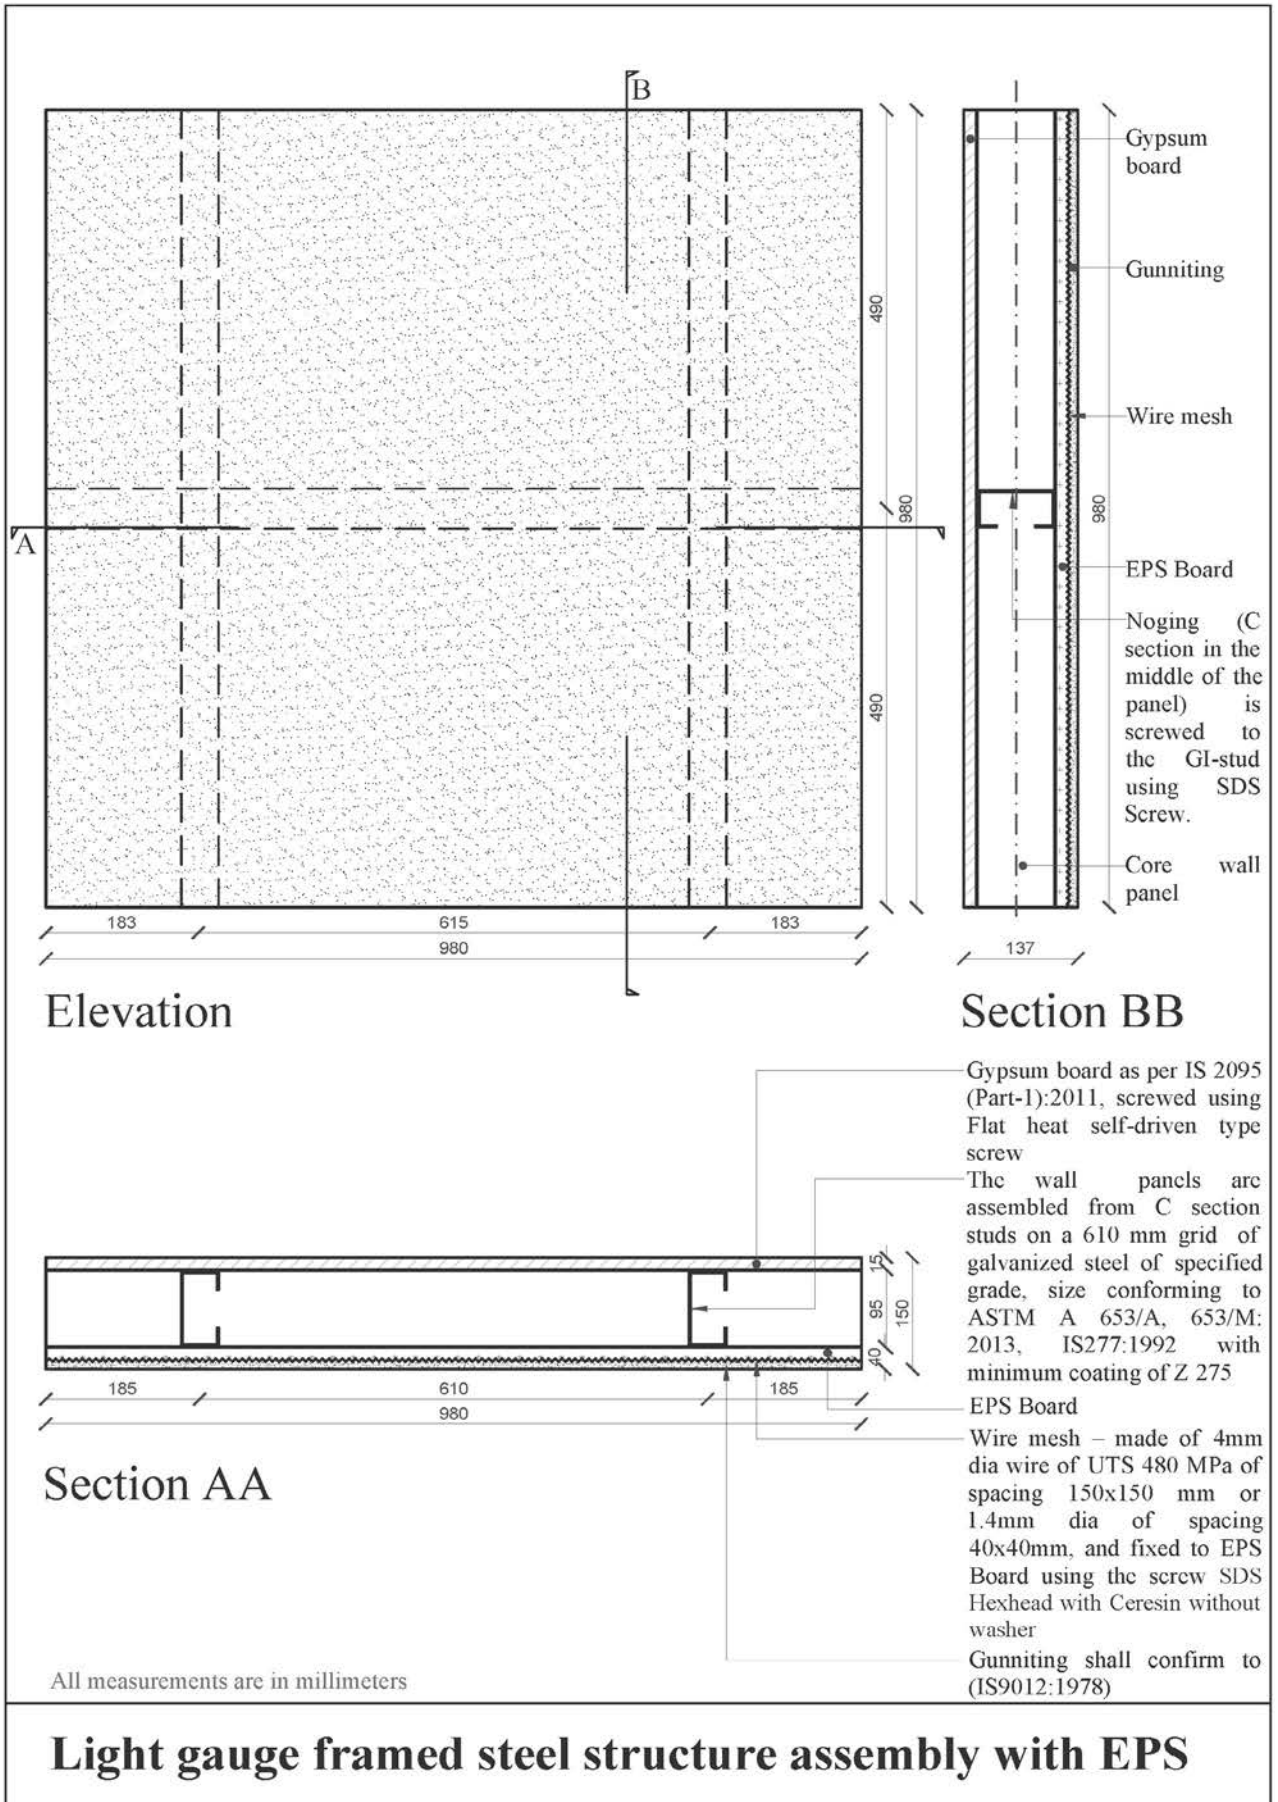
Schematic drawings of light gauge framed steel structure wall sample: External wall type 1 with EPS as per specifications and drawings found in BMTPC Performance appraisal certificate (PAC) no: 1014-S/2014.
